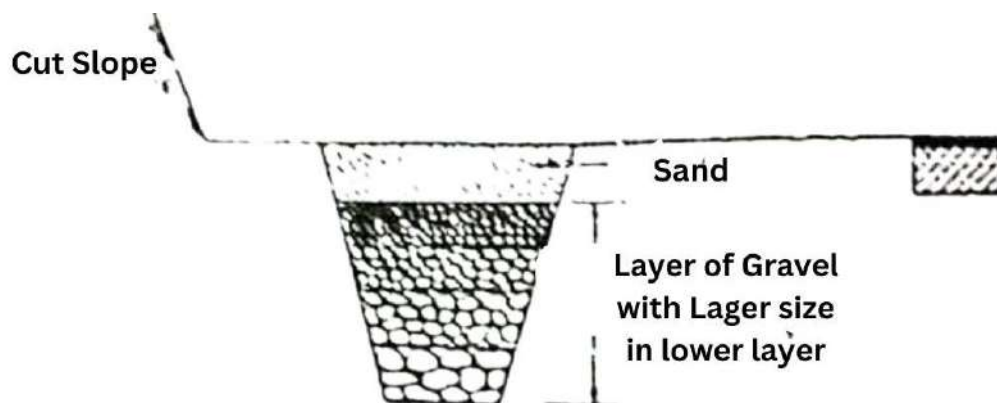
Surface drainage system in Rural Road (source: Khanna & Justo)
